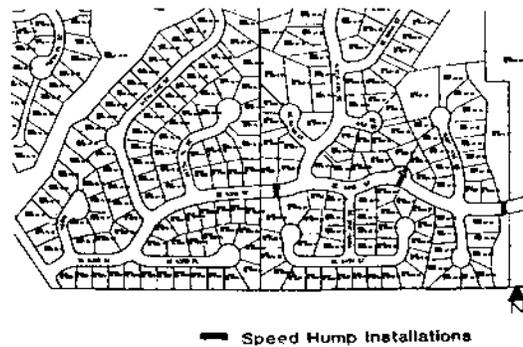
SE 63rd Street with no parallel route (Bellevue, Washington).
